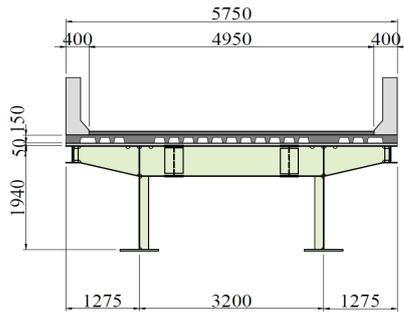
Sectional view of the Shinanobashi Rampway Bridge
